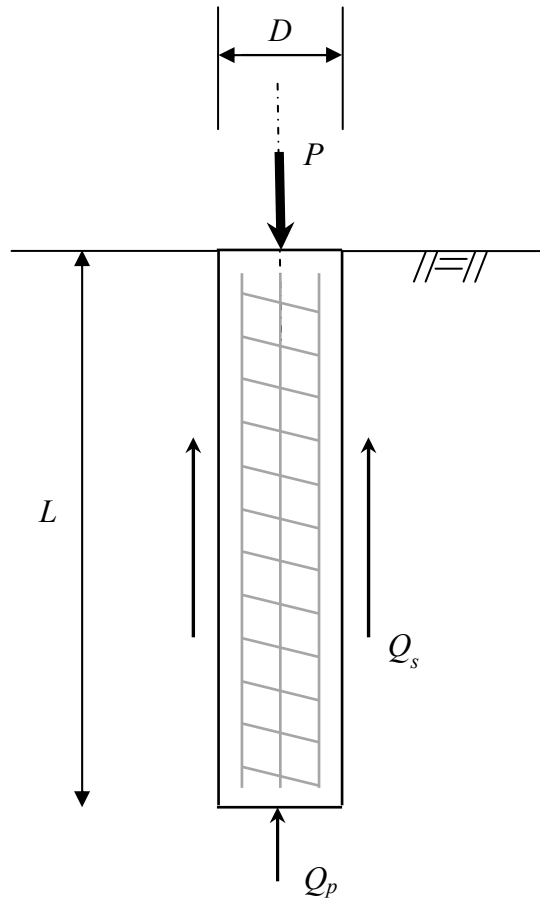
Drilled Shaft Subjected to Axial Compressive Load
